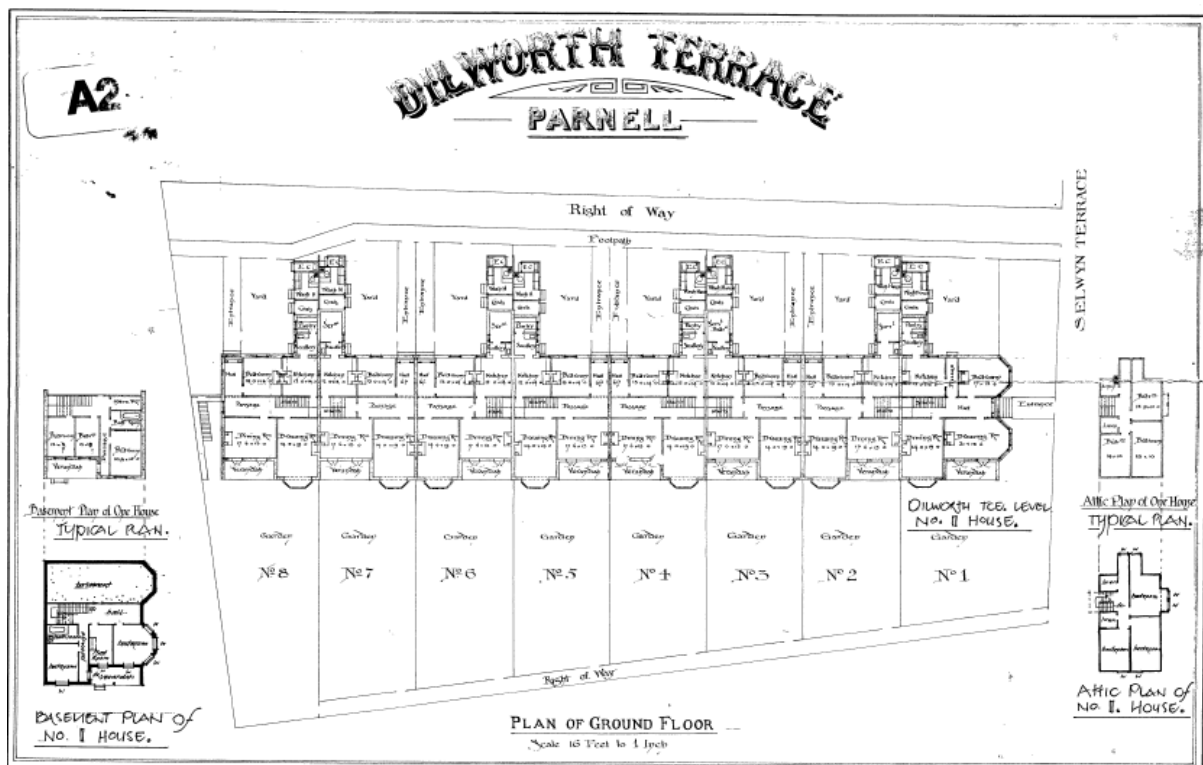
Original floor plan of Dilworth Terrace Houses (Auckland Council Property File)
